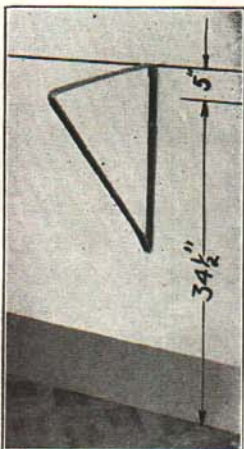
Sink brackets should be attached five inches higher than height of required working surface.
